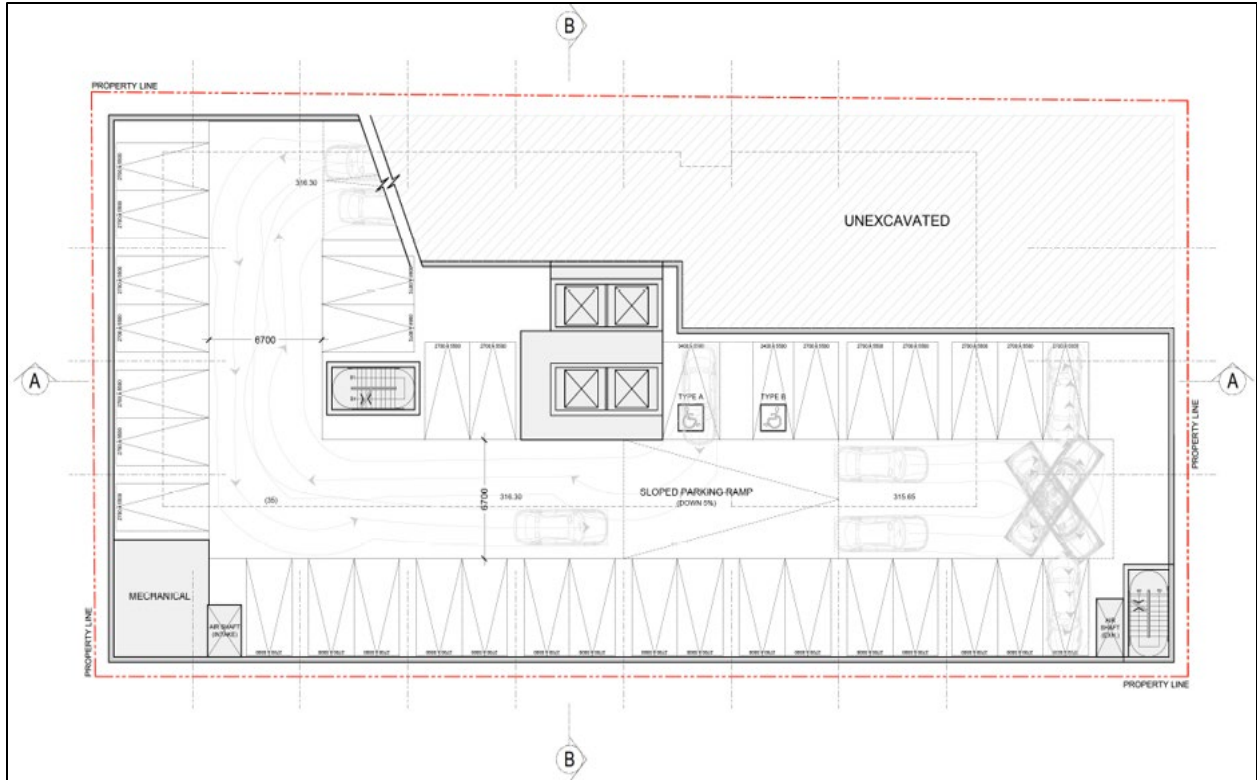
Lower Parking Plan (Source: Hariri Pontarini Architects)
